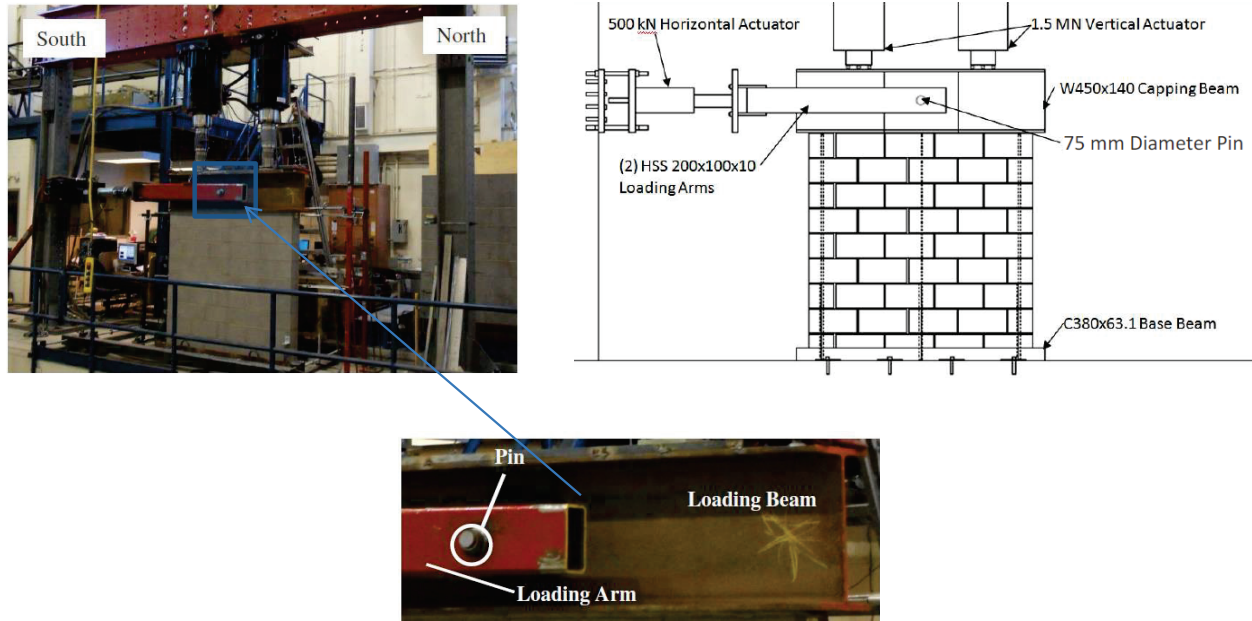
Test setup for masonry shear walls (Dickie and Lissel, 2011)
